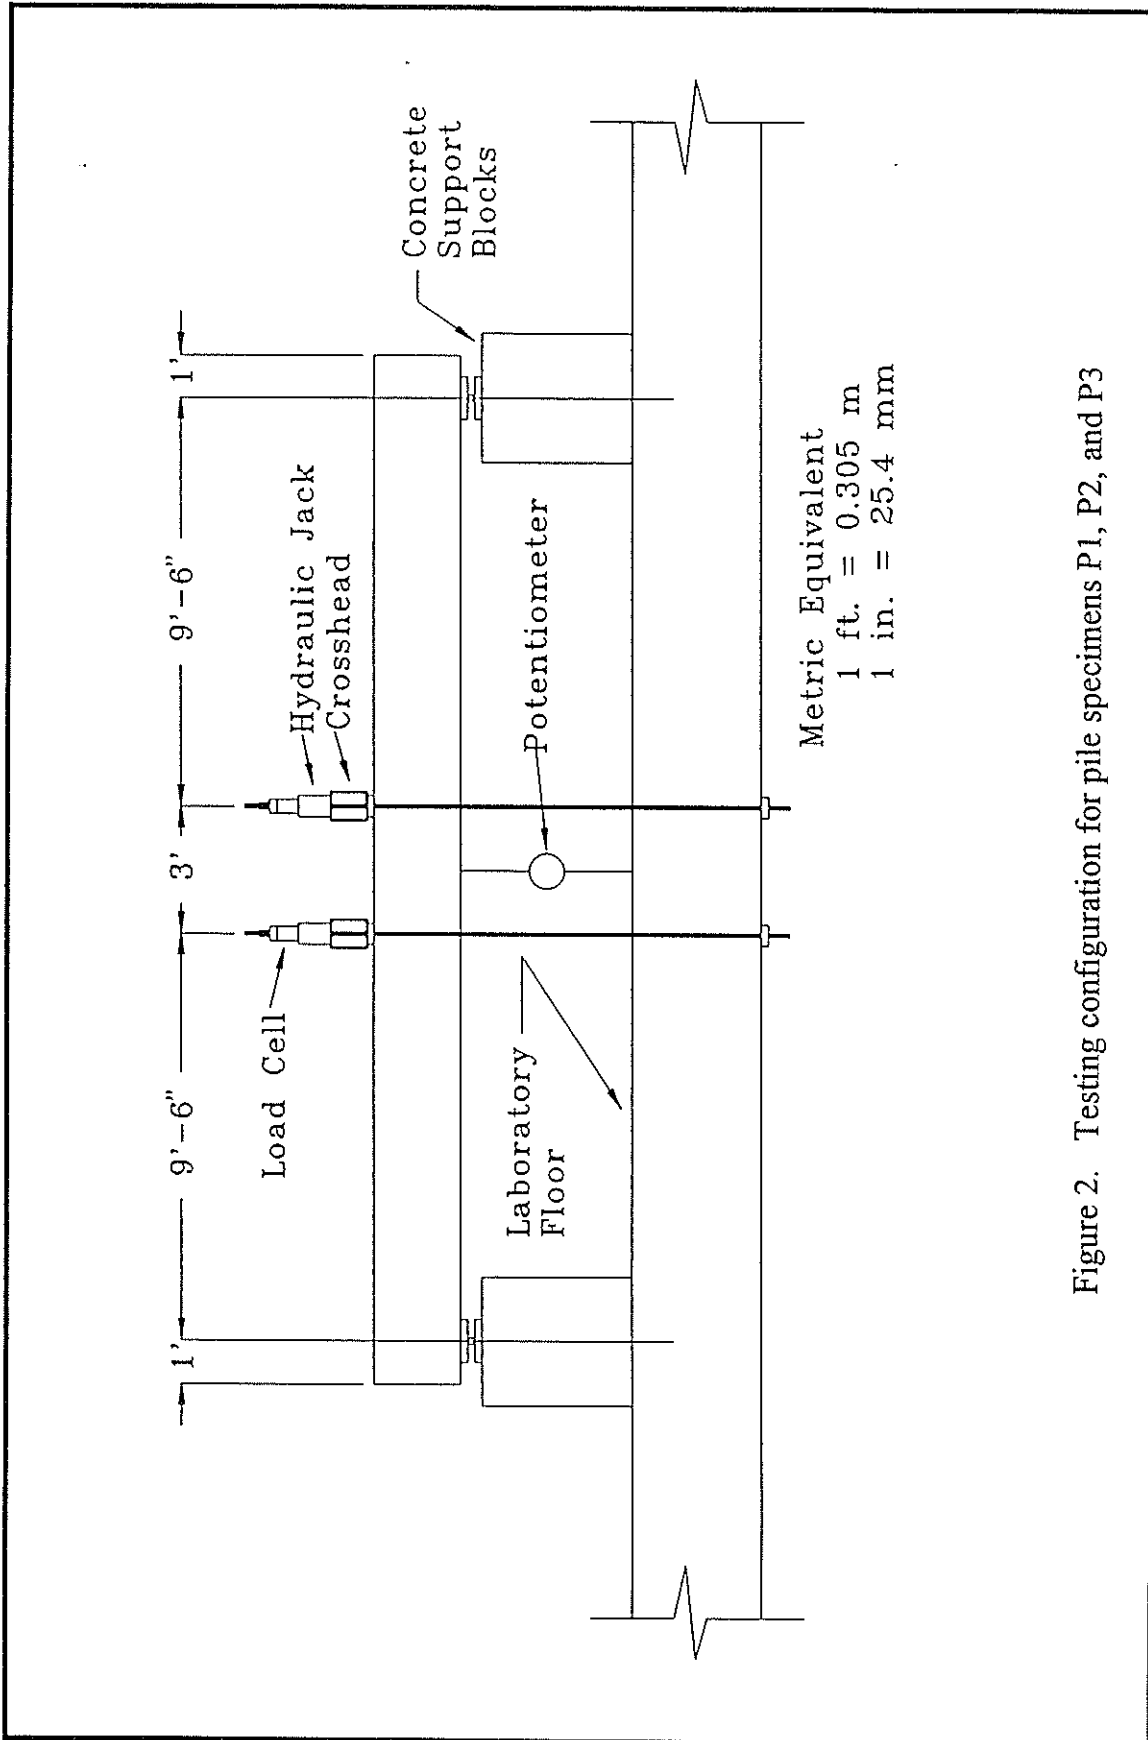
Testing configuration for pile specimens P1, P2, and P3
